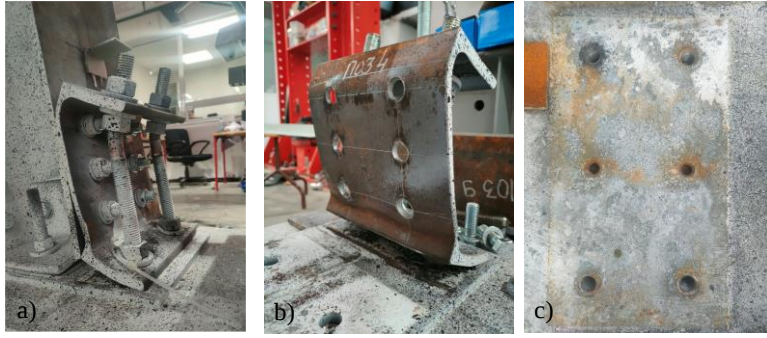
Specimen disassembly: a) joint upon testing; b) flange cleats upon unbolting; c) concrete foundation after steel joint components demounting
